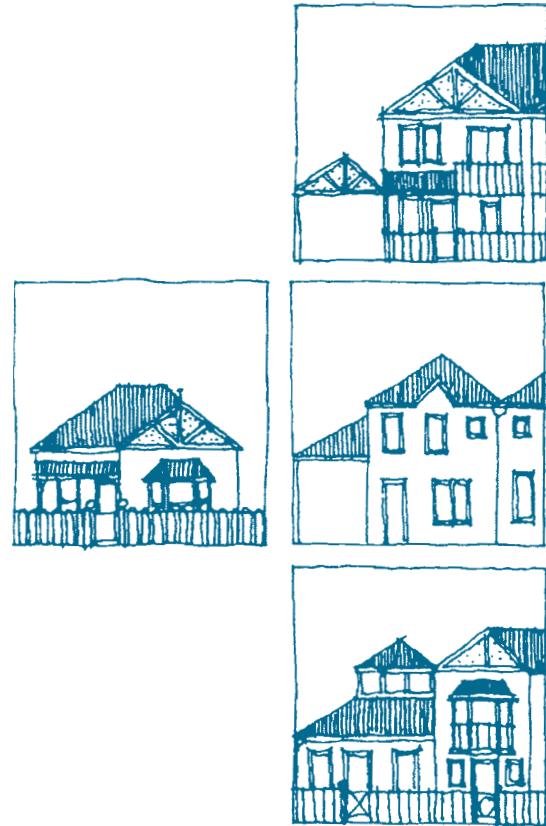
Dwelling design to suit context, with similar roof pitch and height within one storey of neighbour at street frontage.
